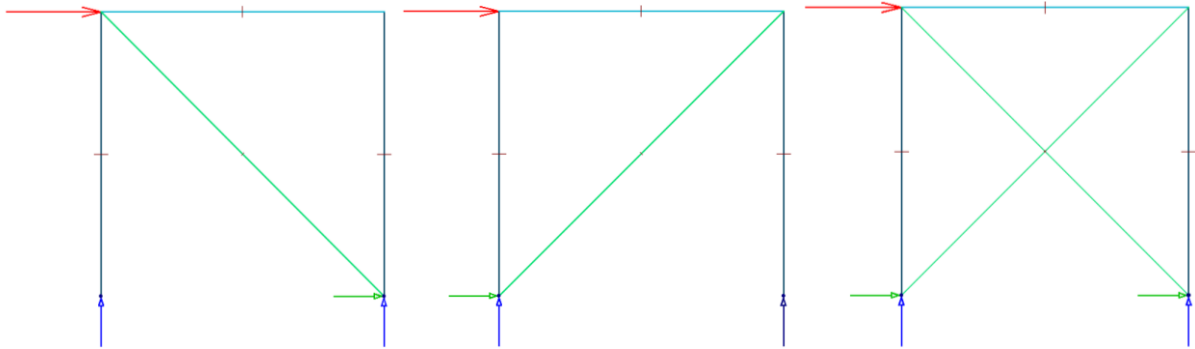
One story frame with different bracing subjected to horizontal loading.
